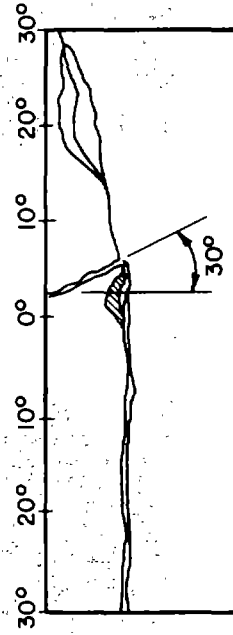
MAP OF DAMAGE TO ARCH-1 AT FAILURE
